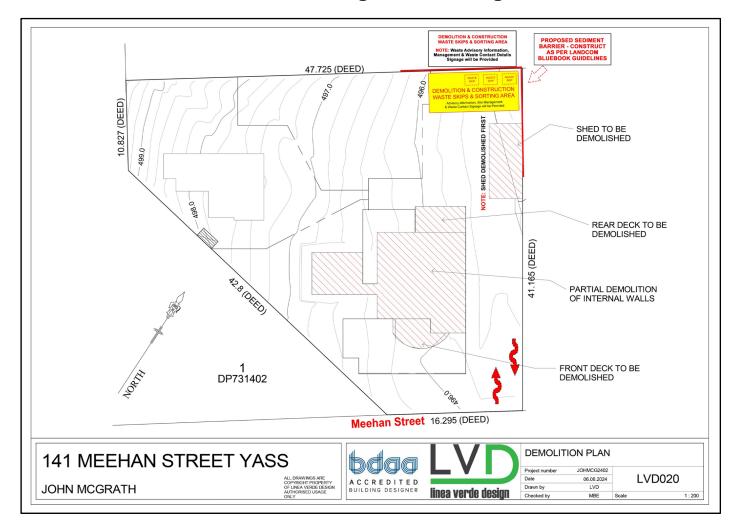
Proposed Demolition & Construction Site Plan for the Subject Property
